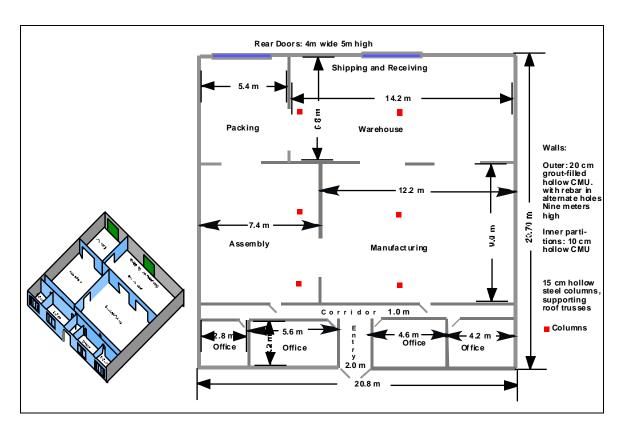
Planimetric floor plan and isometric rendering of an industrial/storage building.
